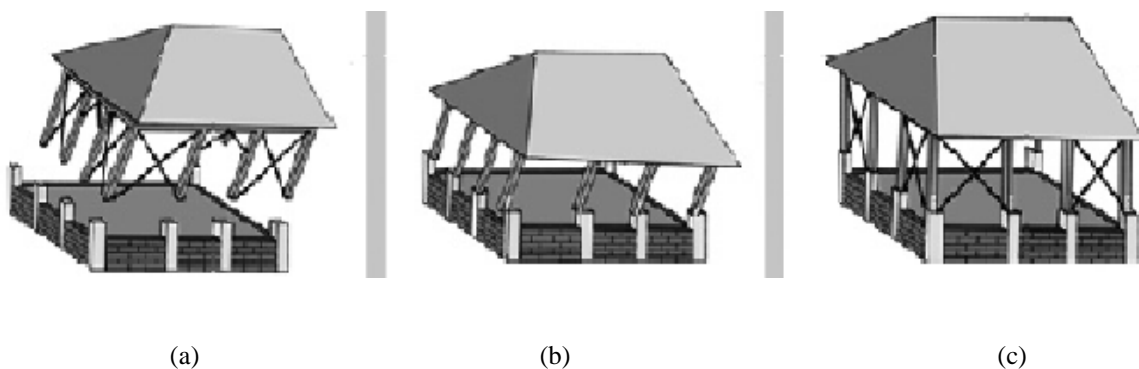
(a) improper Anchorage (b) No bracing (c) Proper bracing and anchorage
